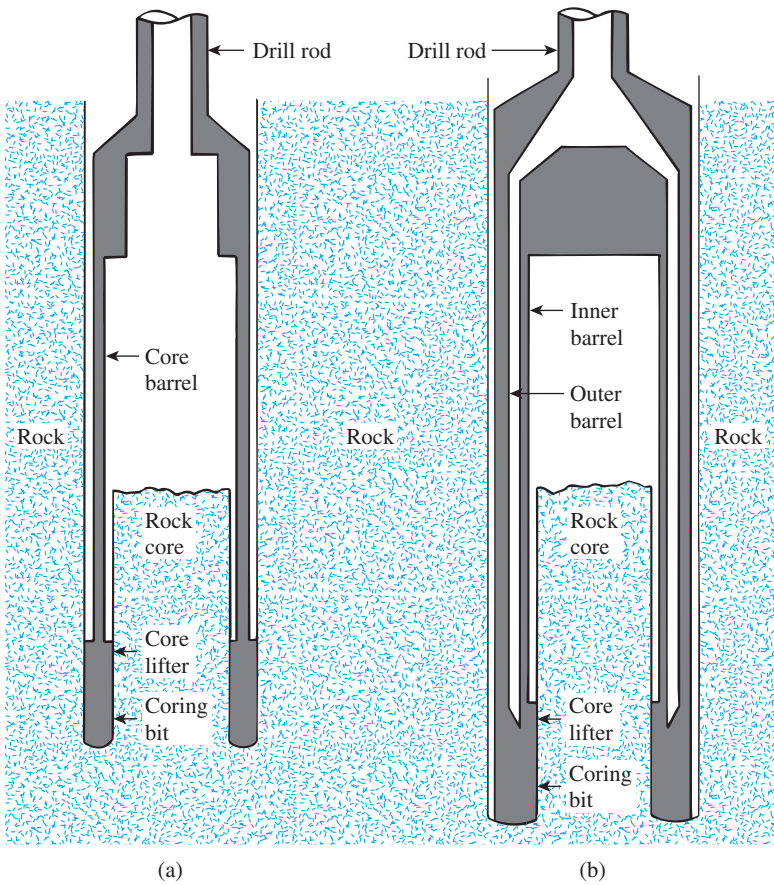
Rock coring: (a) single-tube core barrel; (b) double-tube core barrel
